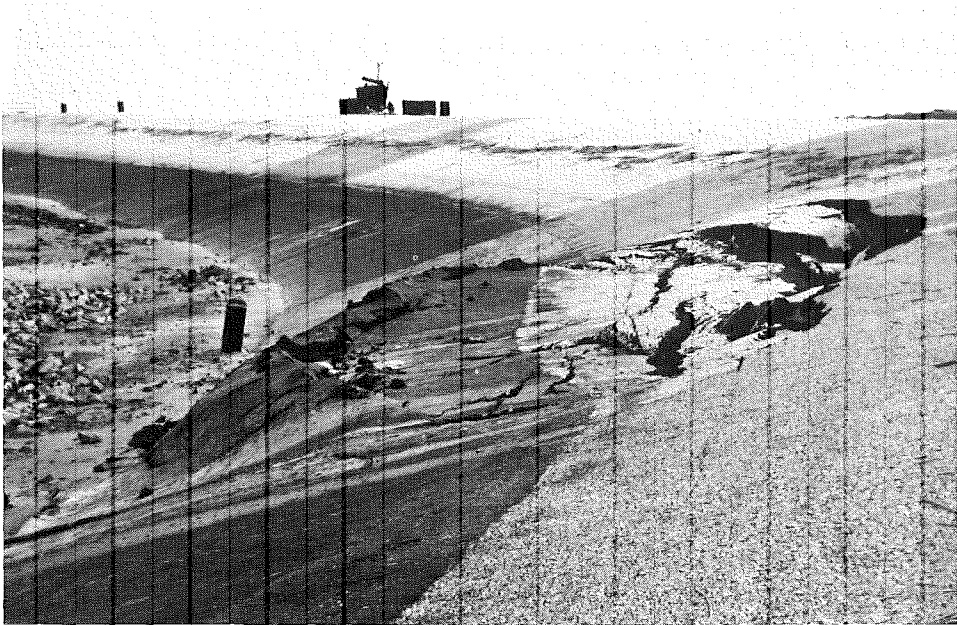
Failure of an asphaltic concrete revetment due to instability of the sub-soil
